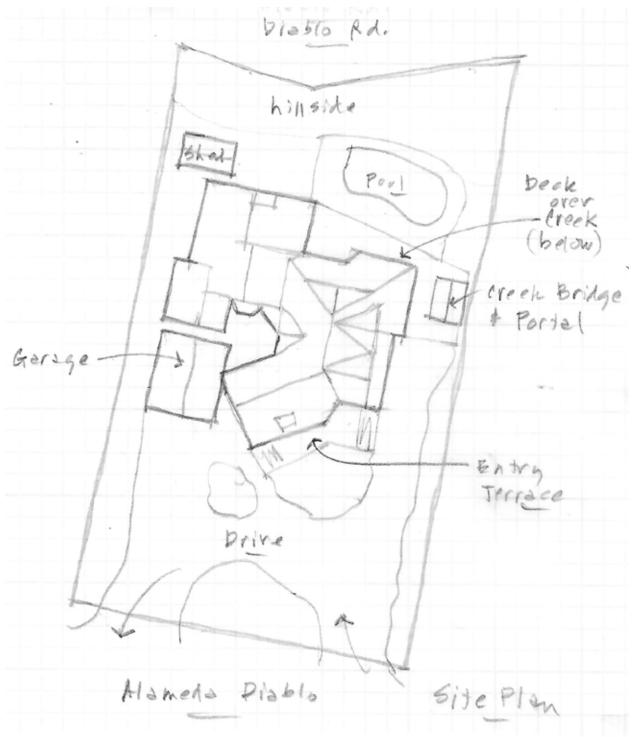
1850 Alameda Diablo – Site plan (note: south is up)
